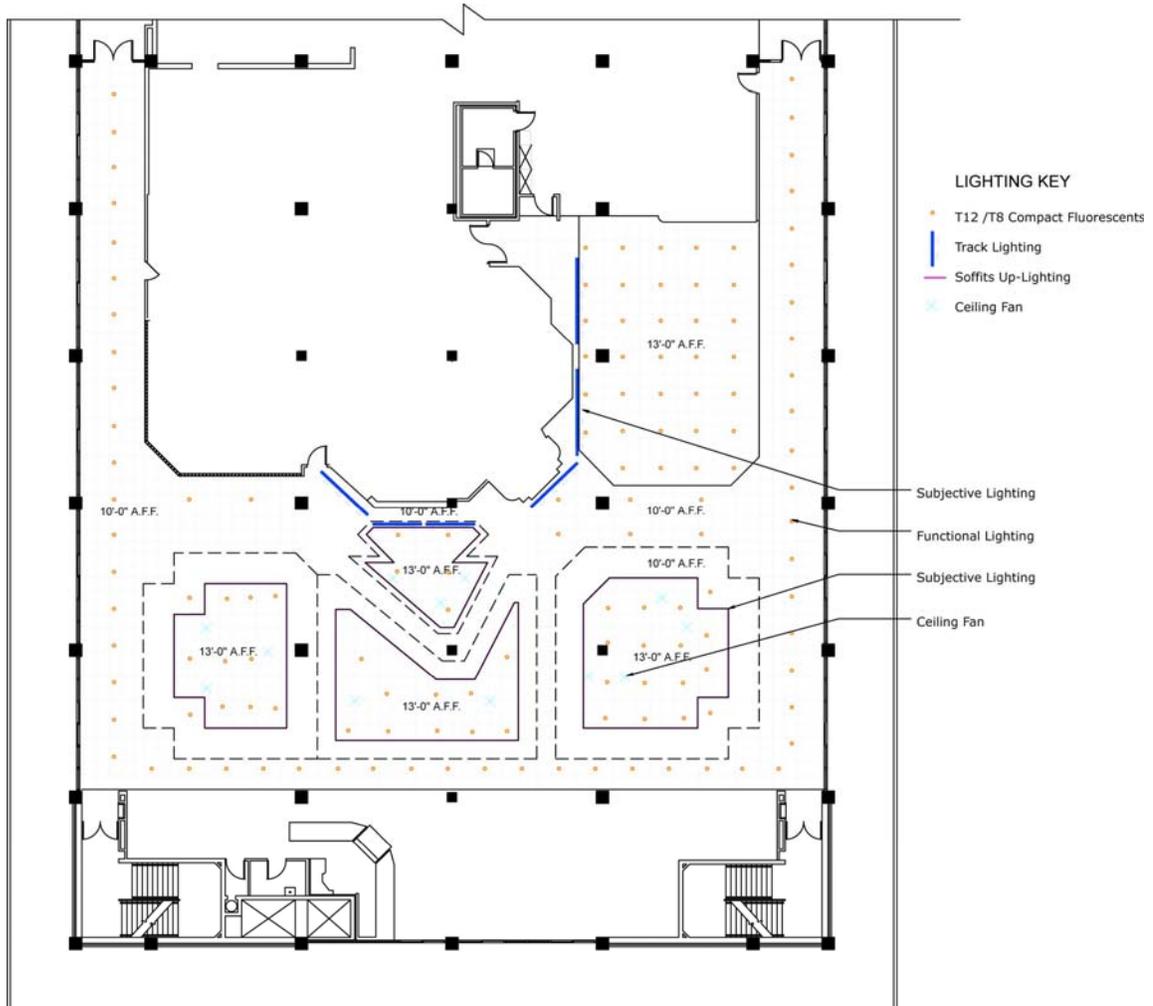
Lighting Plan of Fast Food Dining Facility
